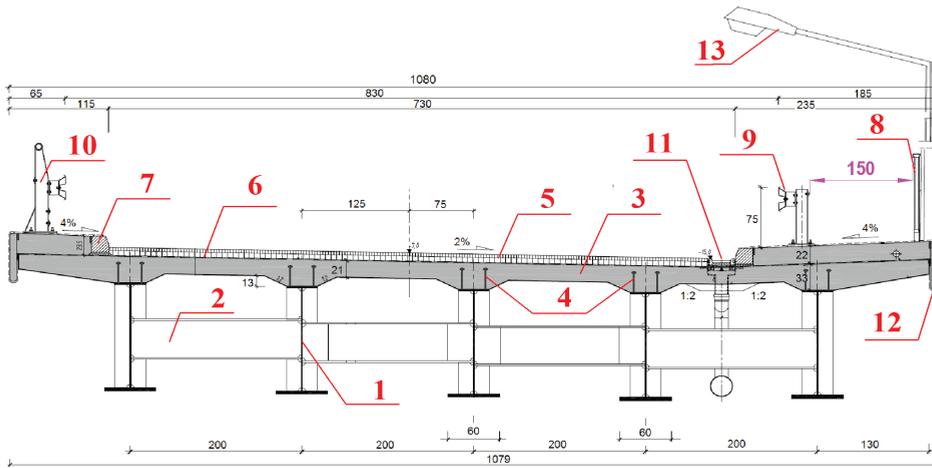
The cross-section of composite highway bridge ¹²⁹
